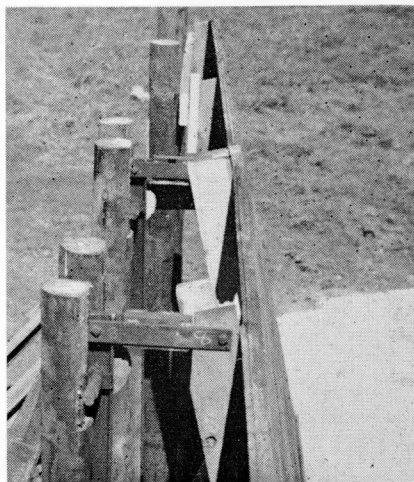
Top link and vertical lever used to measure force at top of sloped and vertical walls in experimental bunker silo.
